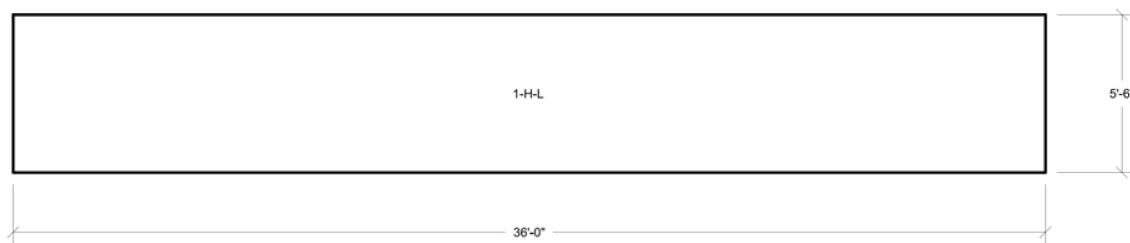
H.7-18 Roof of Tunnel Looking Down Horizontal Reinforcement Zones Near Side and Far Side Faces
